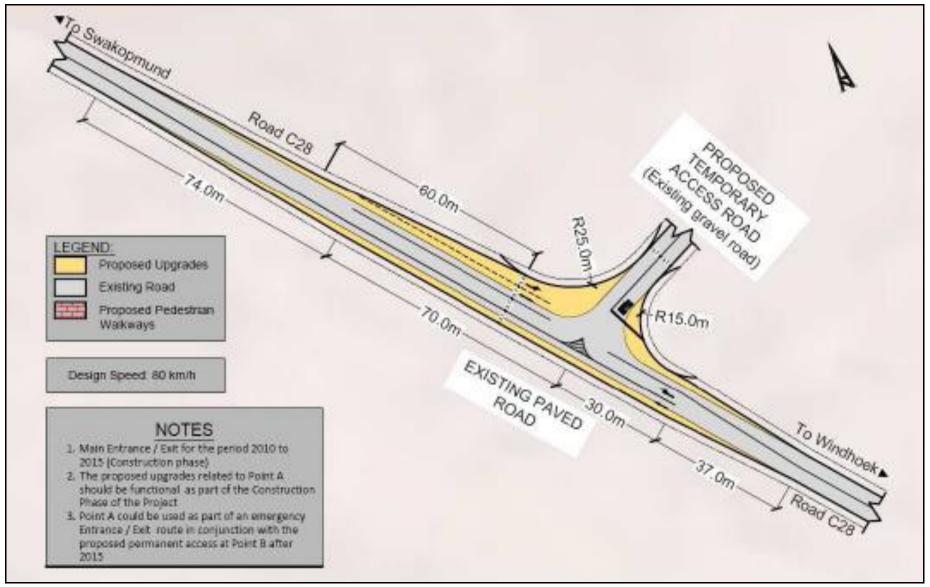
Recommended Upgrading of the Intersection of the C28 and the Temporary Access Road (Siyazi, 2010)
